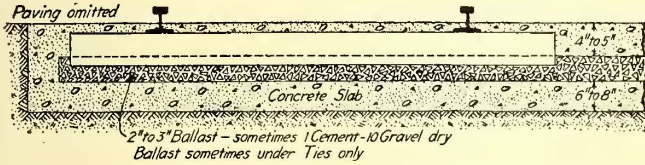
CONCRETE SLAB SUB-BALLAST CONSTRUCTION.
